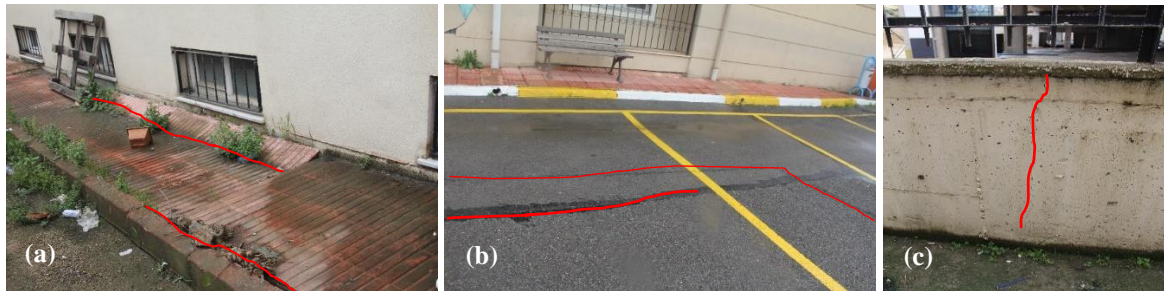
Soil damages:(a) side ground surfaces; (b) covered ground; (c) garden wall
